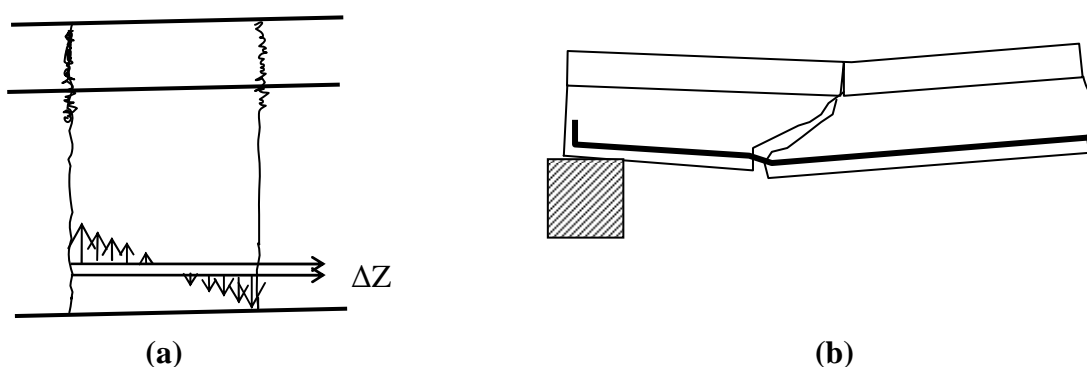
(a) the cantilevered concrete teeth. (b) dowel action of the main reinforcement
